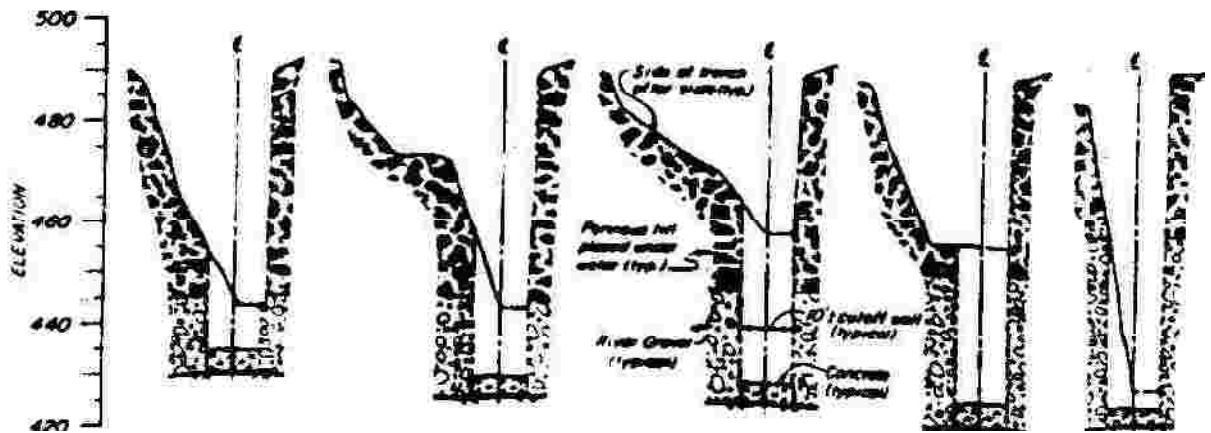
Typical sections of slumped slurry trench (natural scale, in feet)
